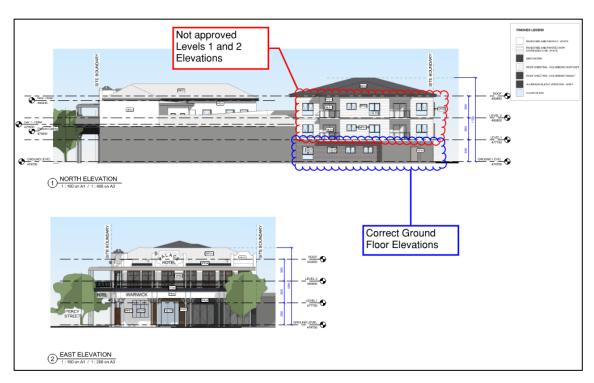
Northern and Eastern Elevations – Correct Ground Level Elevations (Amended by Council 19 August 2024)
